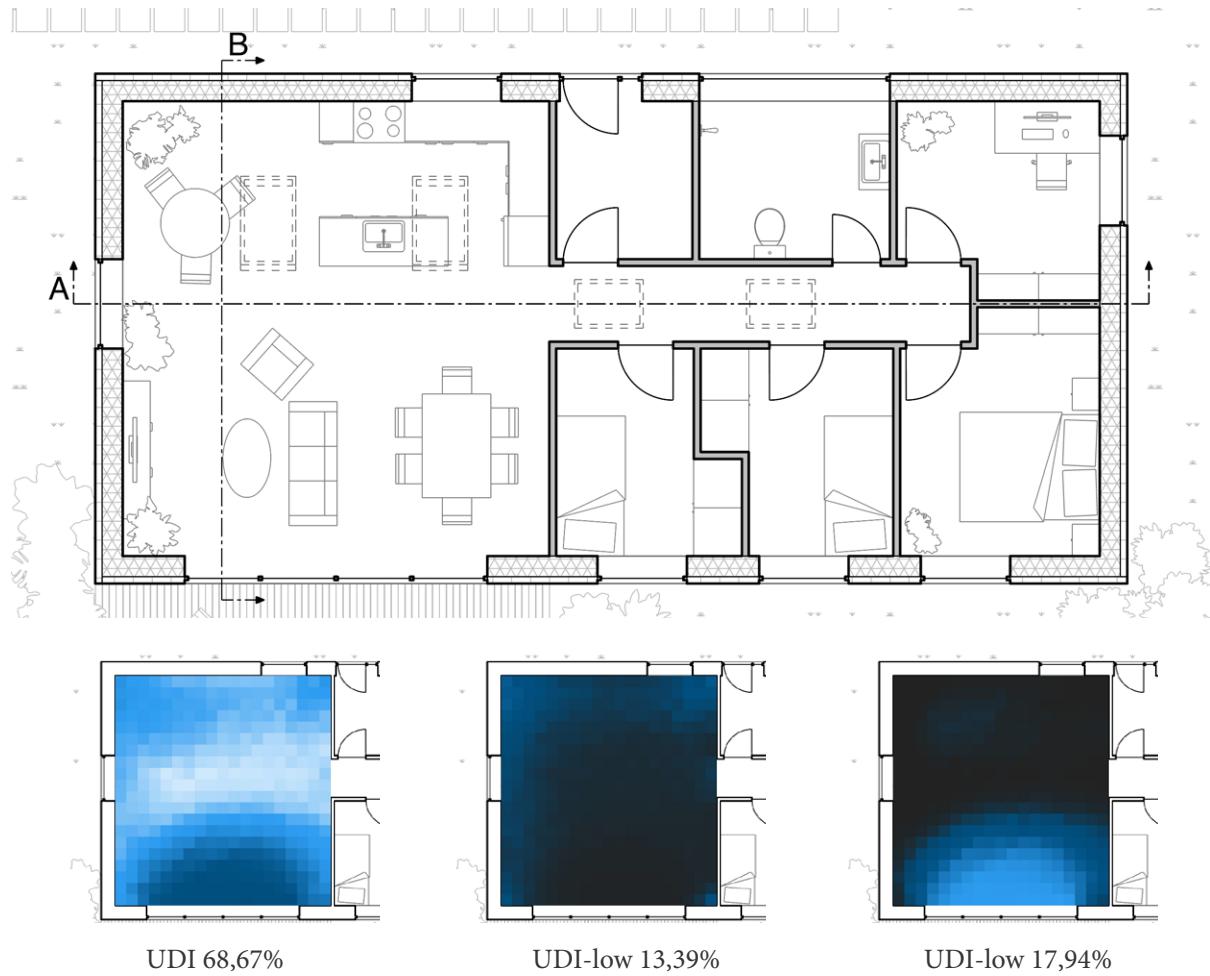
Plan in 1:100 after renovation along with the daylight results, seen below the plan.
